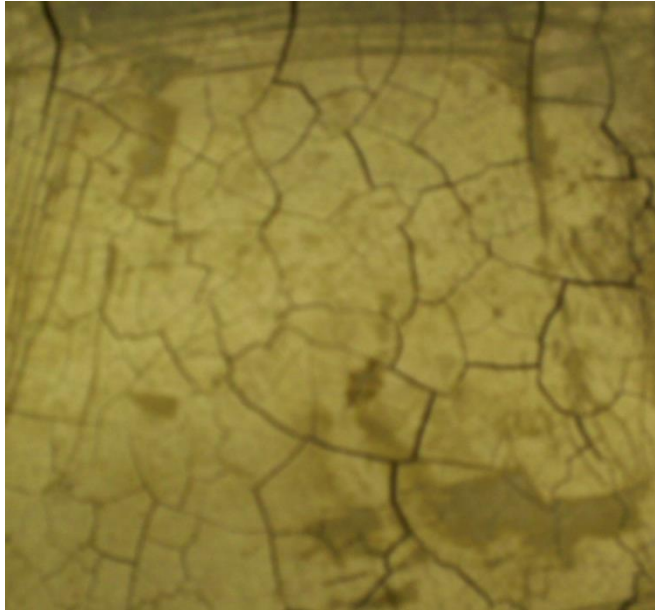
Damages of concrete prepared from cement CEM II/A-V 42,5 R after a thermal load of 600 °C
